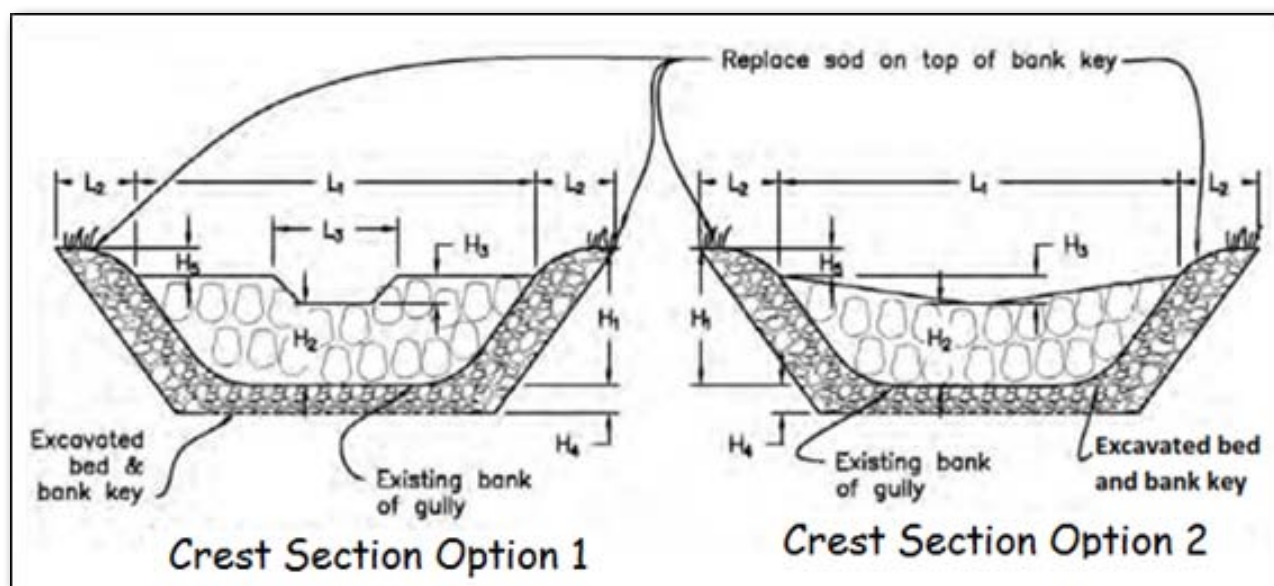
Cross section of a check dam key design at the gully bed and bank (abutment)
